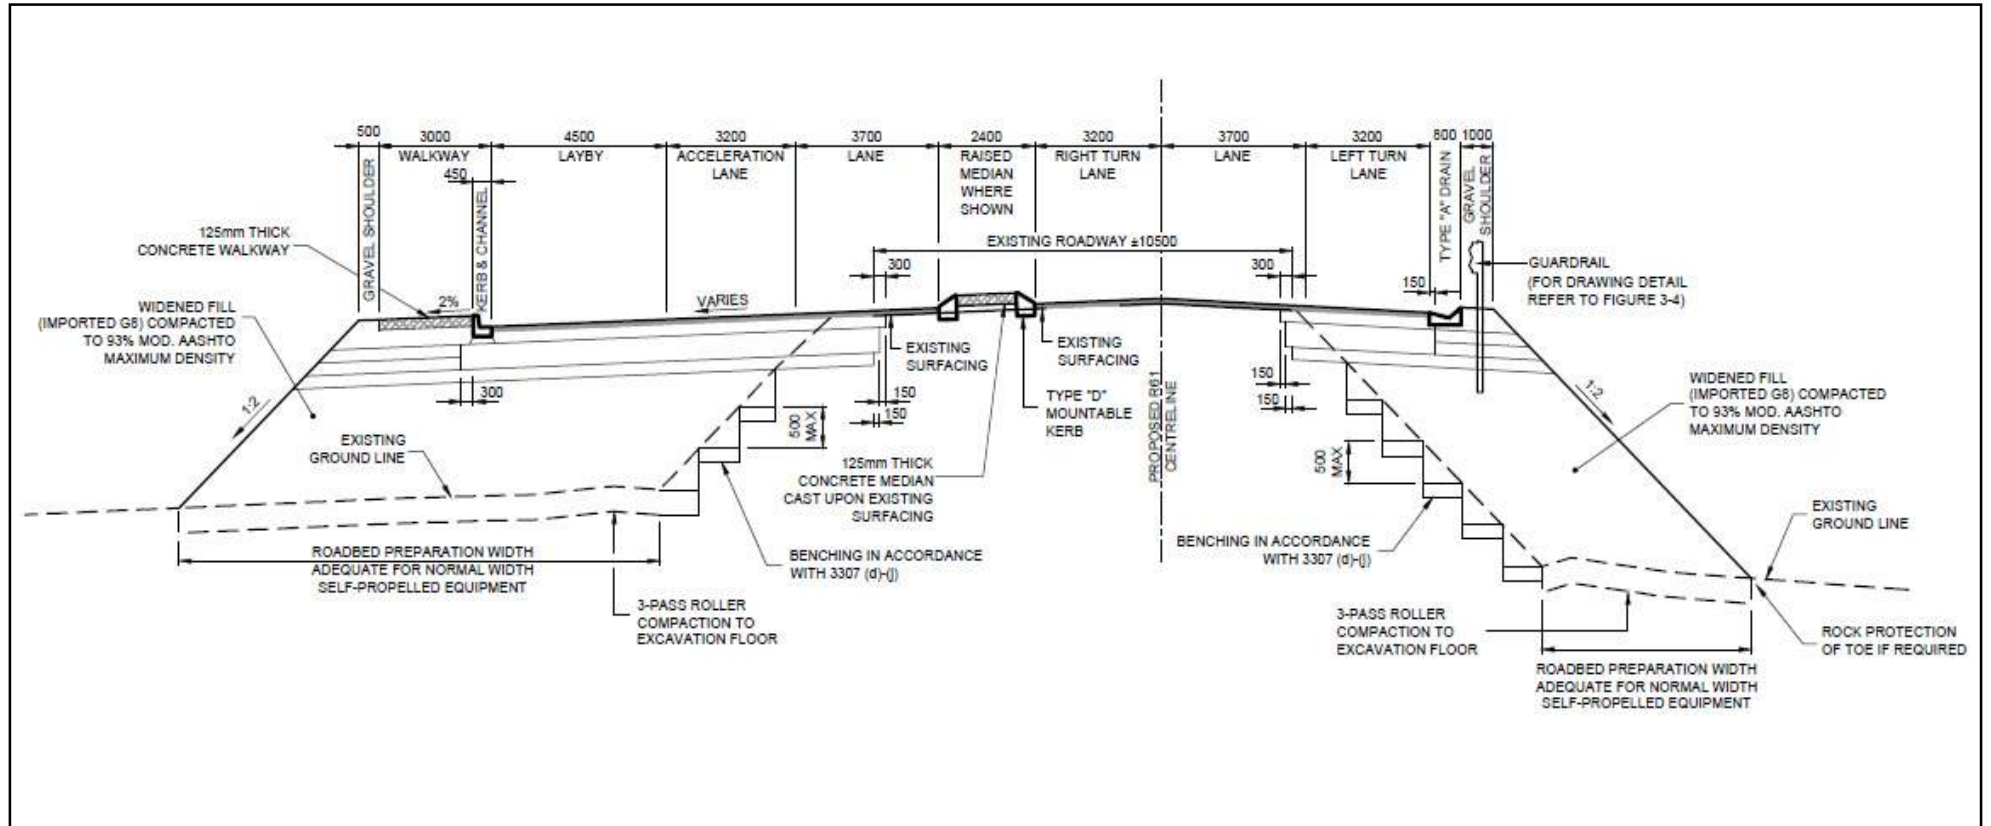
Intersection Widening – Median and Kerb Details (Note: Final pavement layer works – refer Section 8).
